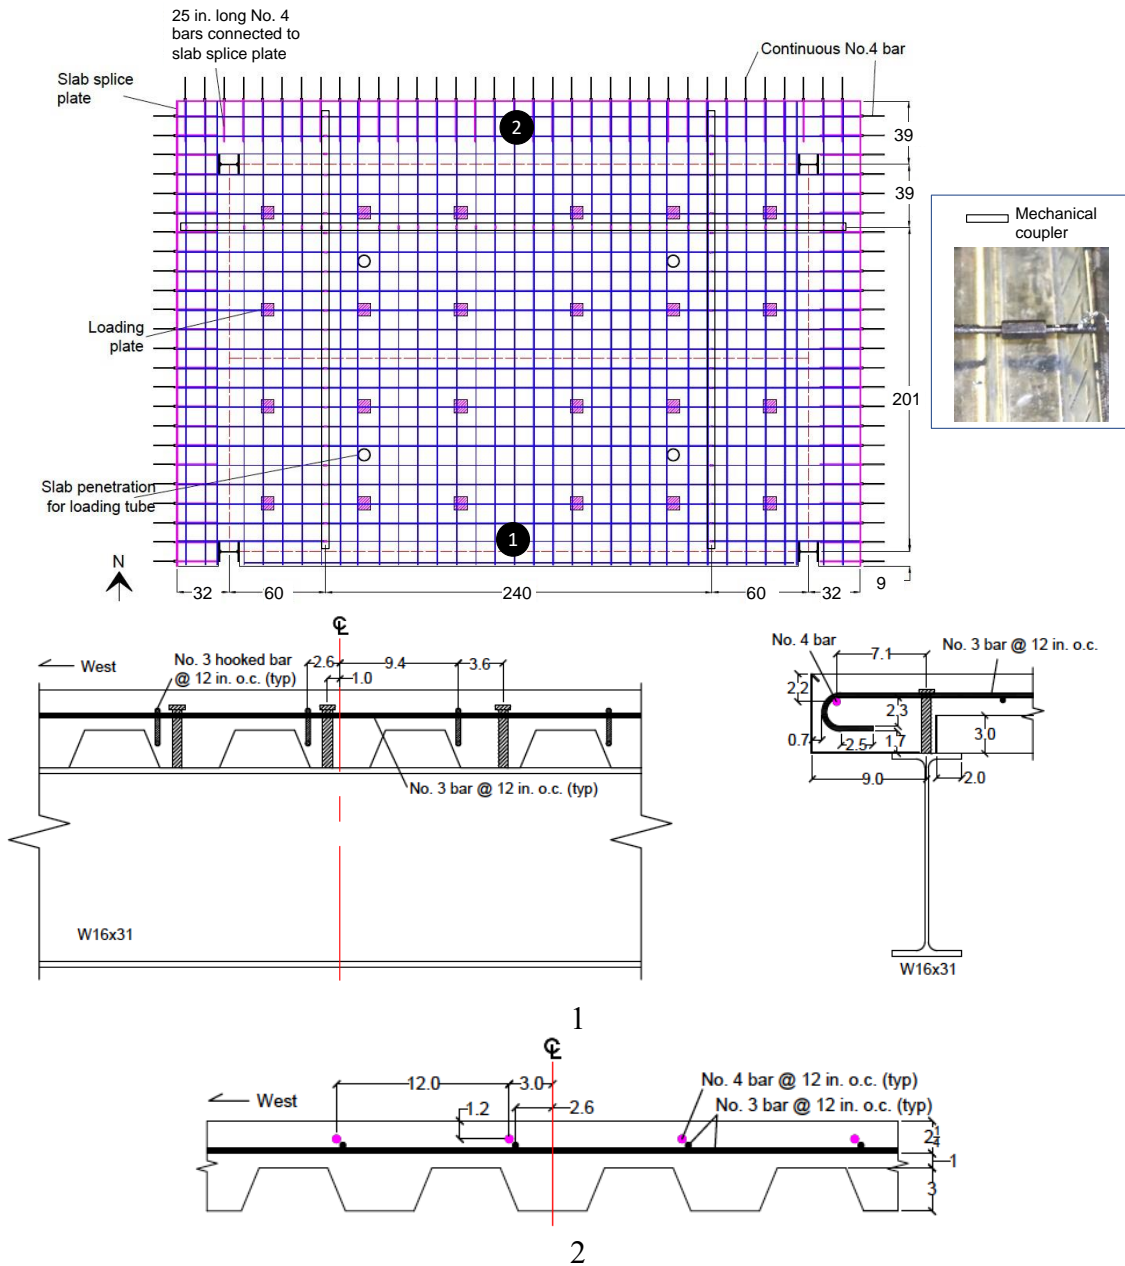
Scale drawings of slab reinforcement. Dimensions are in inches.
